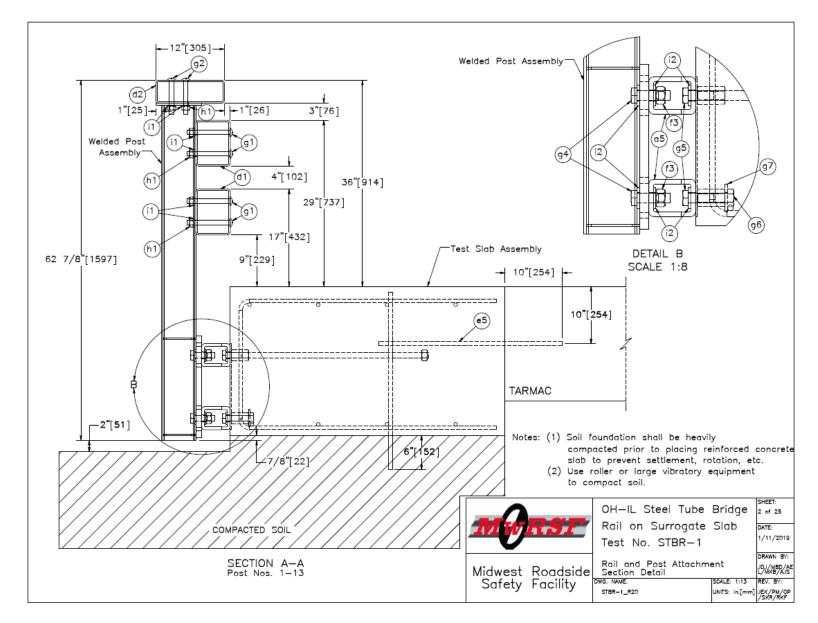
Rail and Post Attachment Section Detail, Test No. STBR-1
